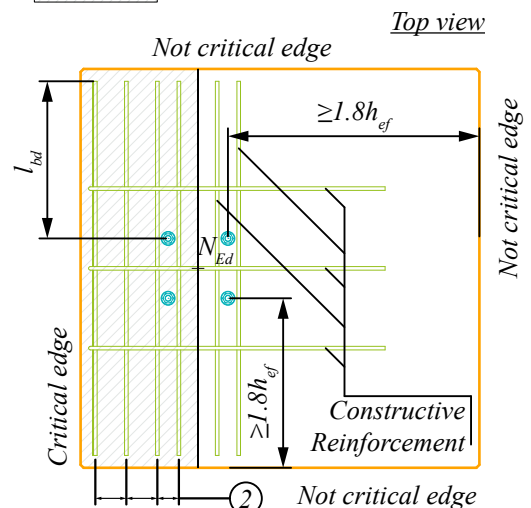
Detail for splitting reinforcement. Example case with one critical edge.
